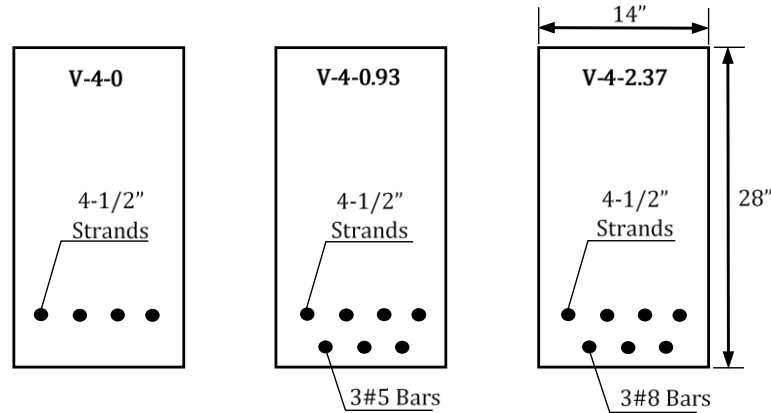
Beams cross section details (Saqa and Frosch, 2009)
